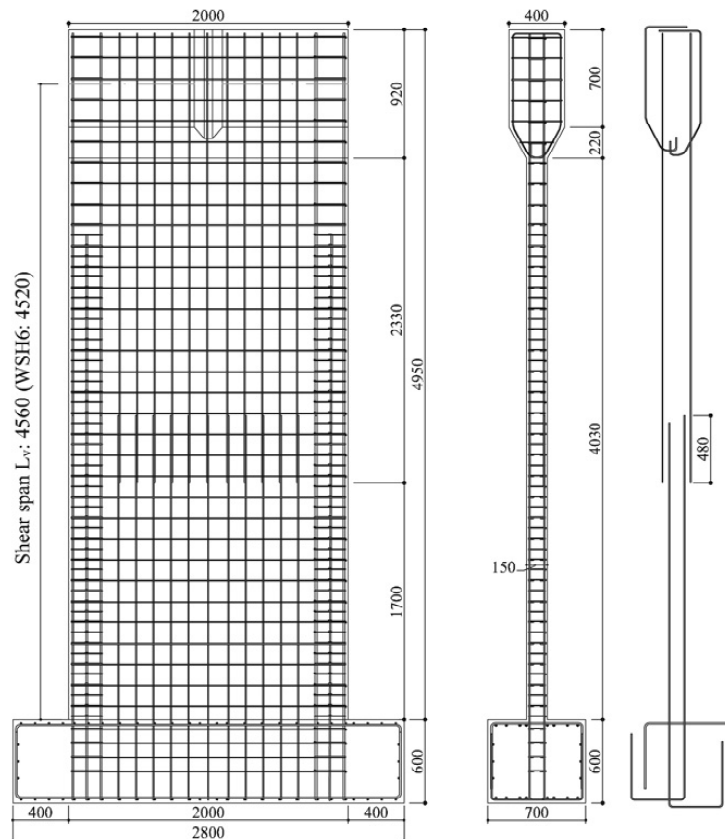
Elevation view of the specimen WSH3 (Dazio et al. 2009)
